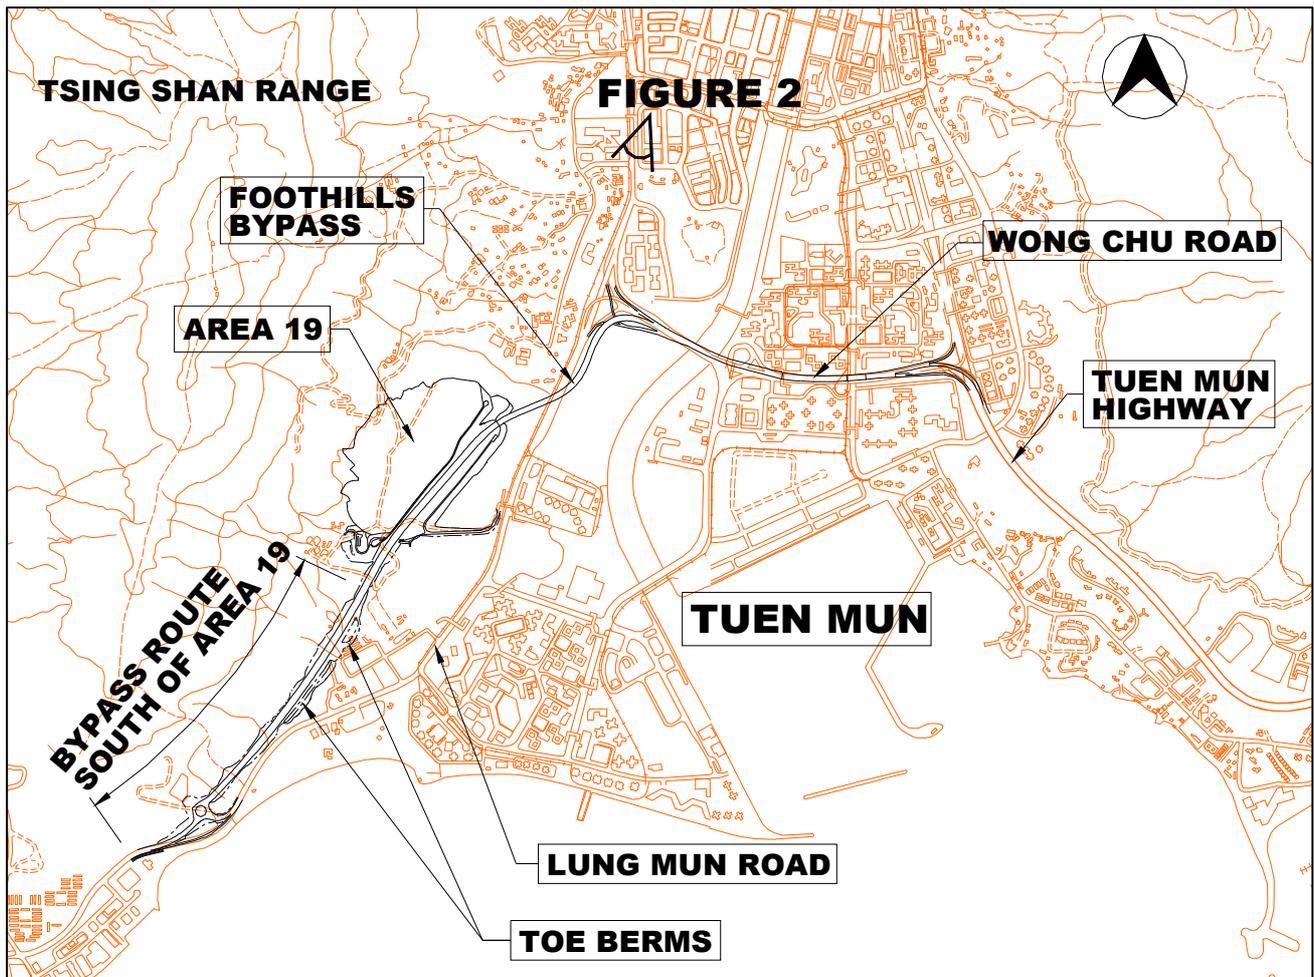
Foothills Bypass & Wong Chu Road layout with connection to Tuen Mun Highway
